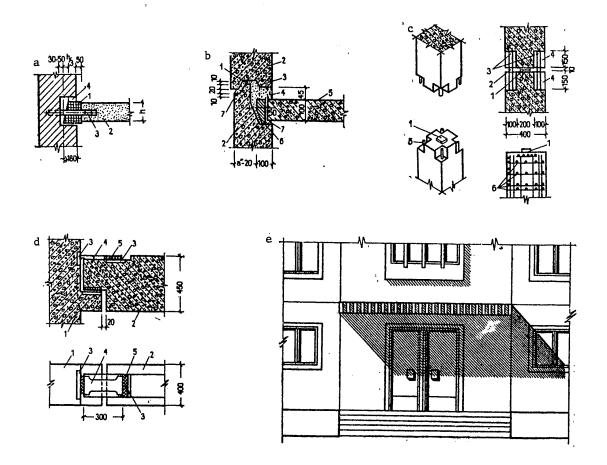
Examples of structural units and parts, architectural details. a--Support of the end of a wooden beam on a rock wall: 1--two layers of roofing felt on resin; 2--preservative treatment; 3--anchor 50x5 mm; 4--finish with mortar; b--structural solution of horizontal joints of outside wall panels with rain barrier: 1--insert made of porous rubber; 2--outside wall panel; 3--cement; 4--mounting gasket (2 per panel); 5--floor panel; 6--insert made of mineral tiles 50 mm thick wrapped in asphalt roofing paper; 7--caulking with mortar; c--flat metal-free column joint: 1--aligning concrete projection; 2--pool welding of reinforcing projections; 3--type-300 mortar; 4--joint recesses; 5--longitudinal reinforcing rods; 6--transverse reinforcing grids; d--structural design of the supporting unit for a truss on a column in a standardized frame: 1--column; 2-truss; 3--embedded parts; 4--top plate; 5--welded joints; 3--entry detail.
